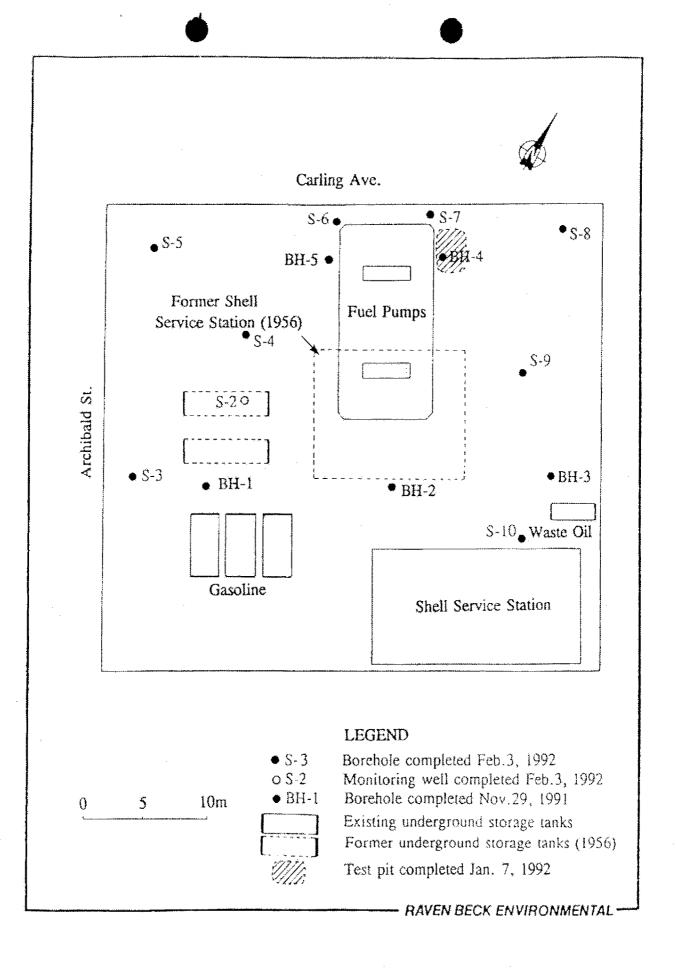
Site Plan of Shell Service Station, 1330 Carling Avenue
